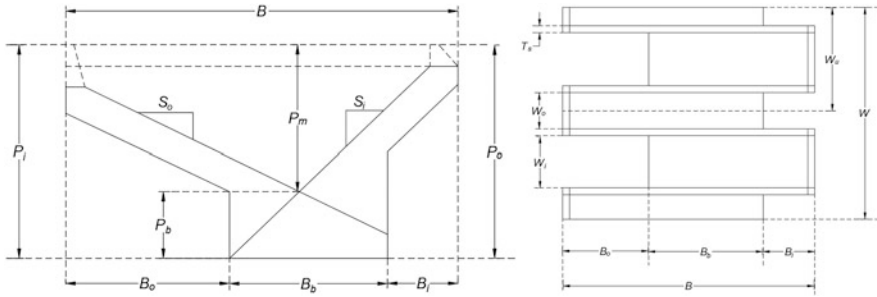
Plan view (left) and cross-sectional view (right) of PKW
